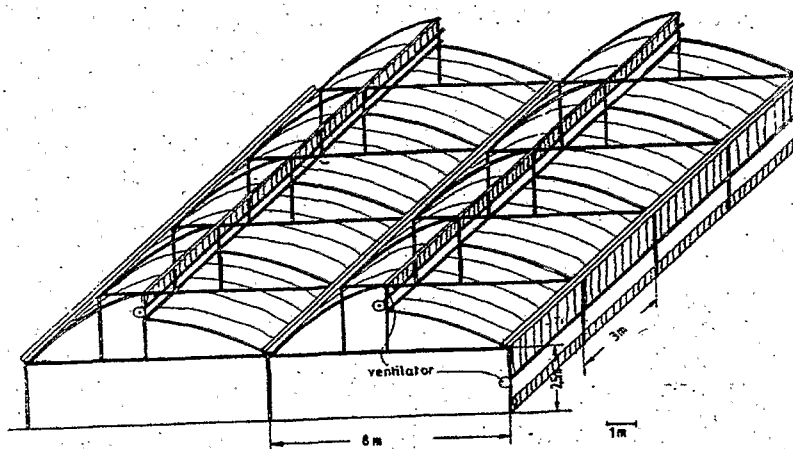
A type of greenhouse with roiling - up ridge ventilation in Israel (FAO booklet, greenhouses in Cyprus).
